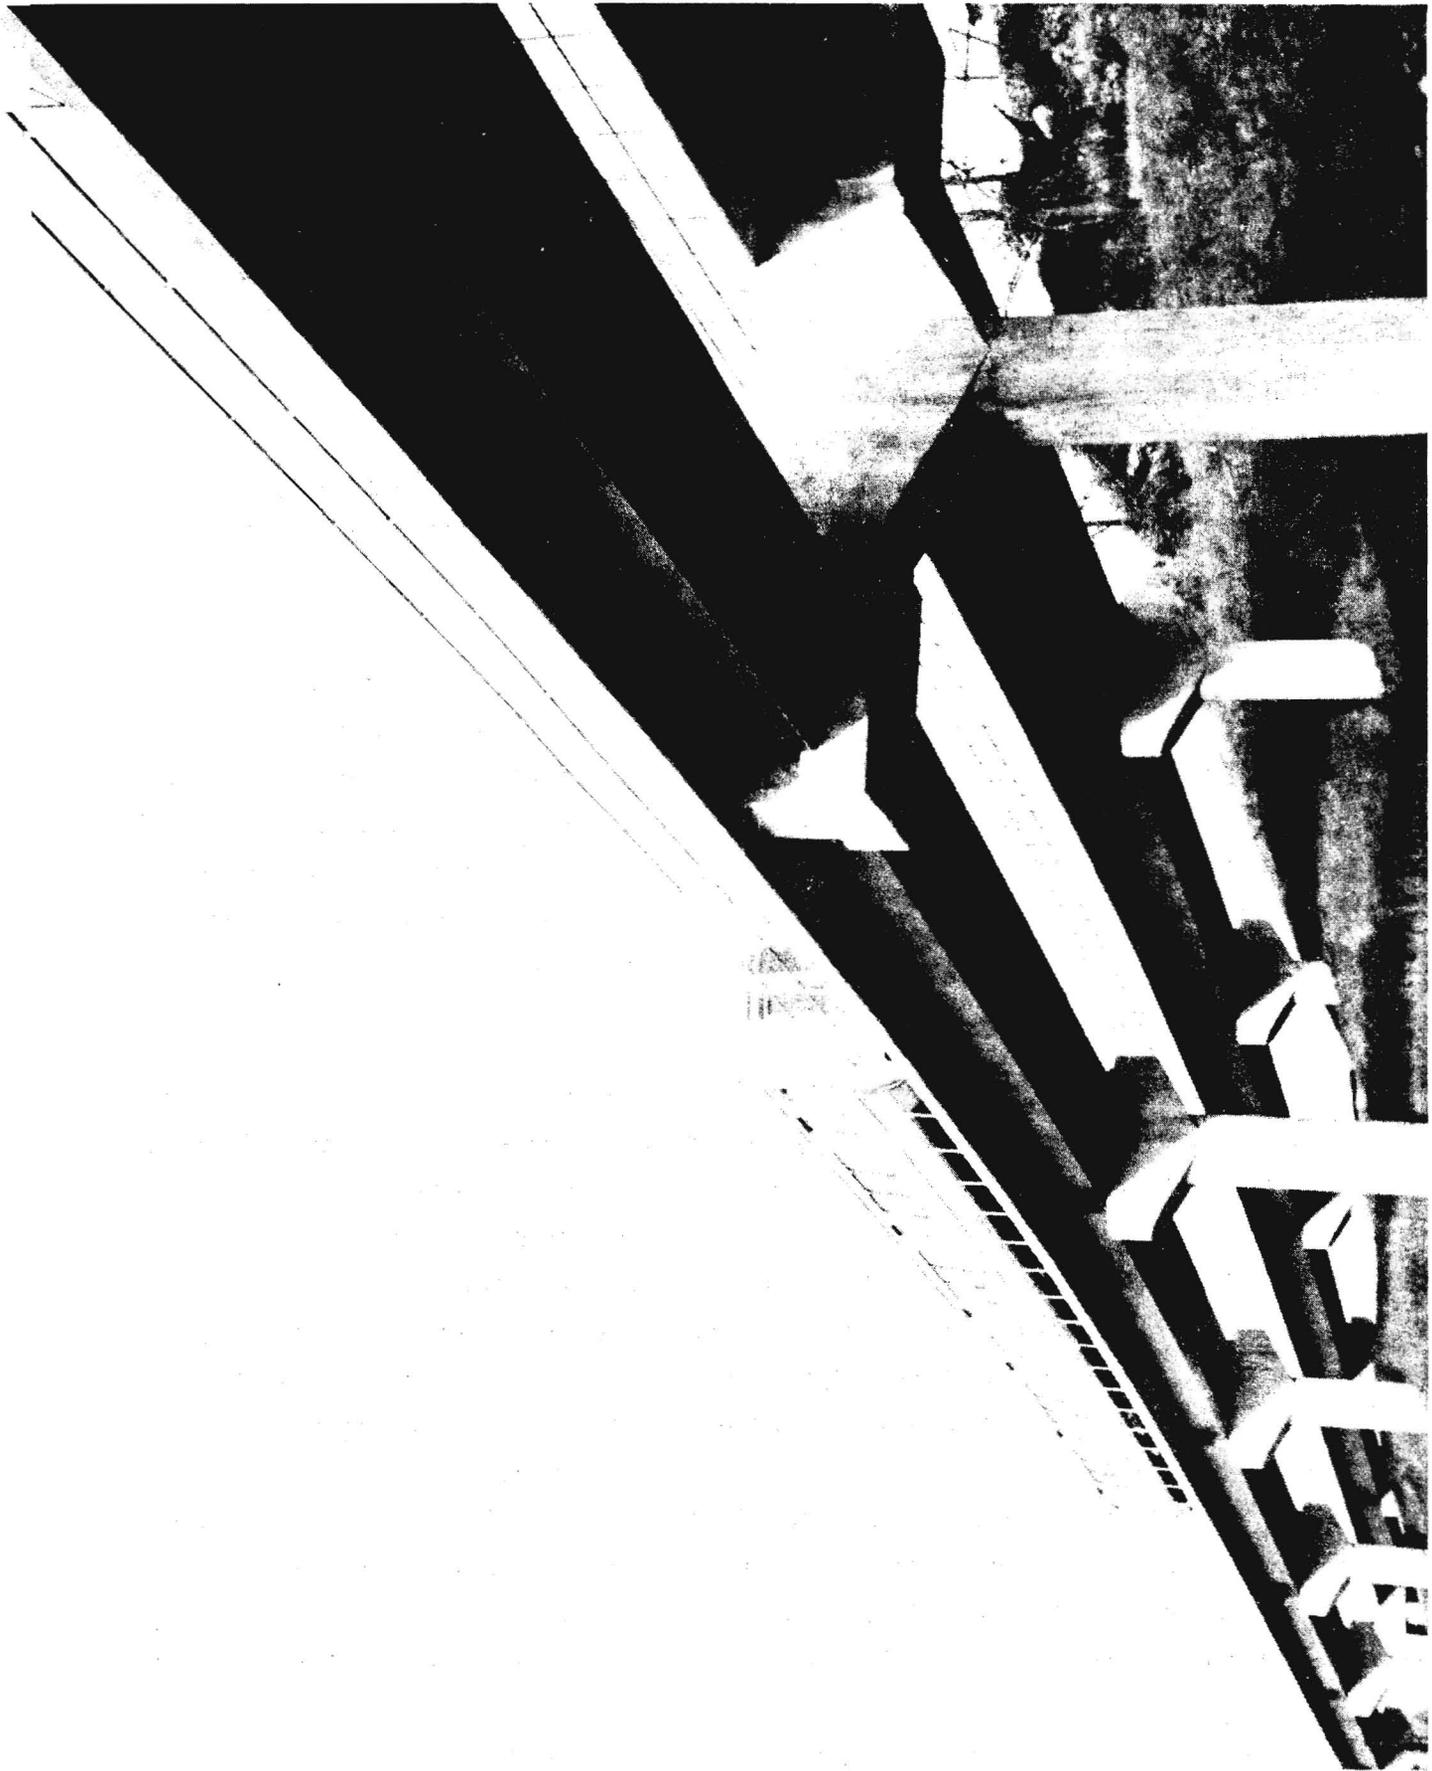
AERIAL TRANSIT GUIDEWAY - Washington Metro
